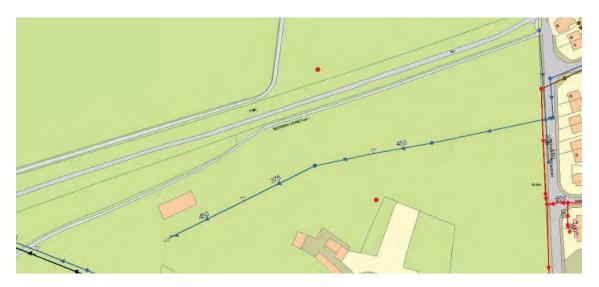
Surface water drain crossing the site shown as blue line. Existing foul sewer shown as red line – source United Utilities searches.
